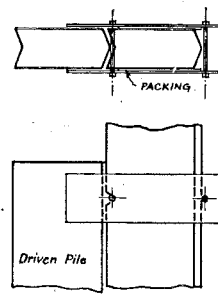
MAKE-SHIFT CLAMP FOR ALIGNING SHEET PILES WHEN WALINGS CANNOT BE USED.
